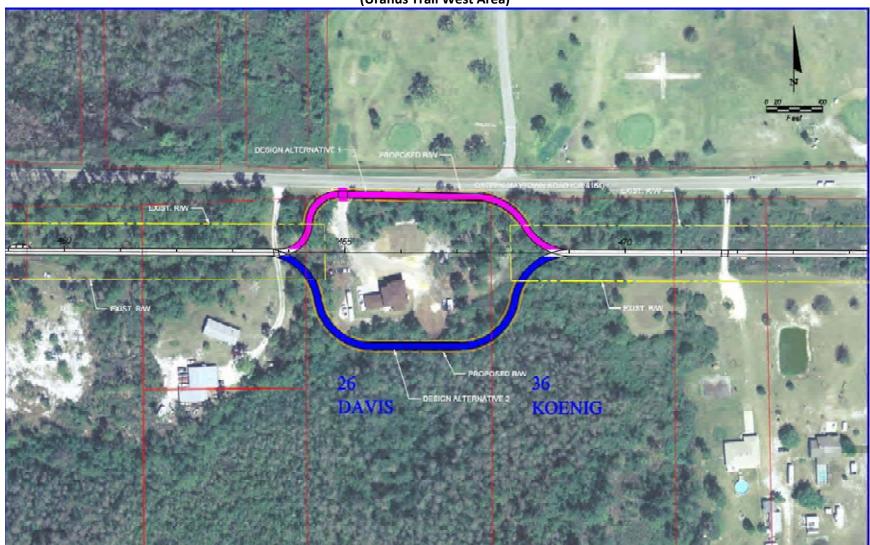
Alternative Alignment Section Sta 464 to Sta 469 (Uranus Trail West Area)
